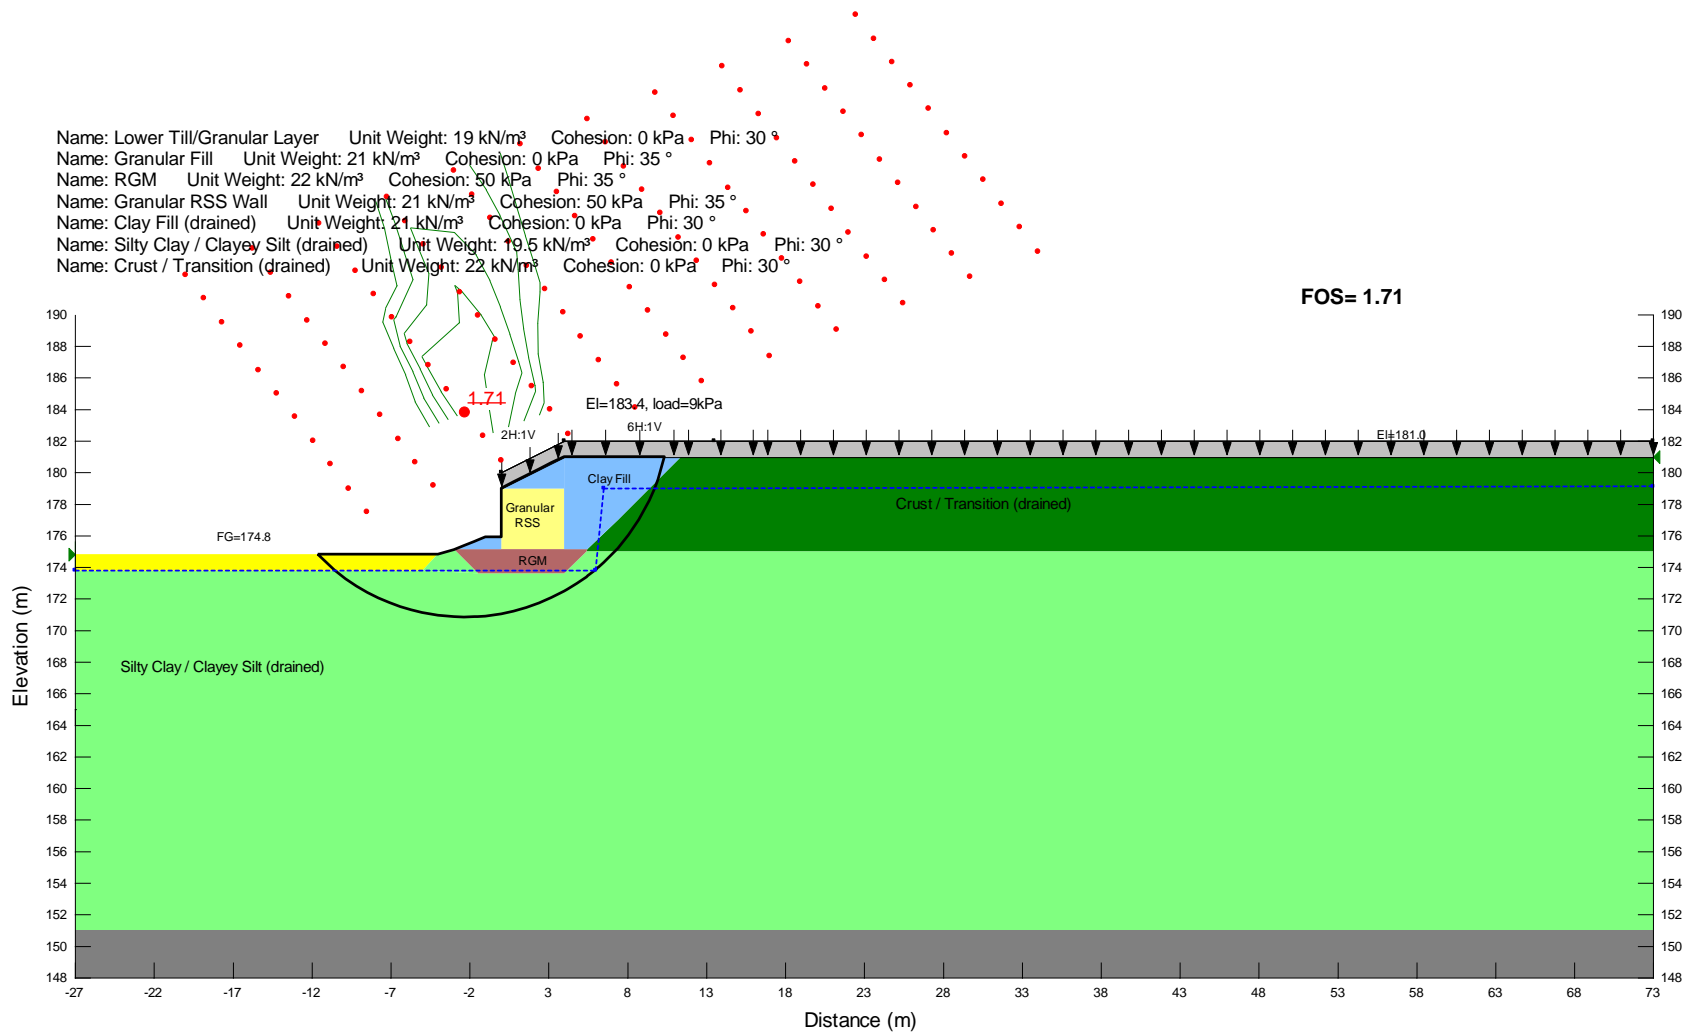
Slope Stability – End of Construction – South Abutment Wing Wall - Station 10+450L Hwy 401
